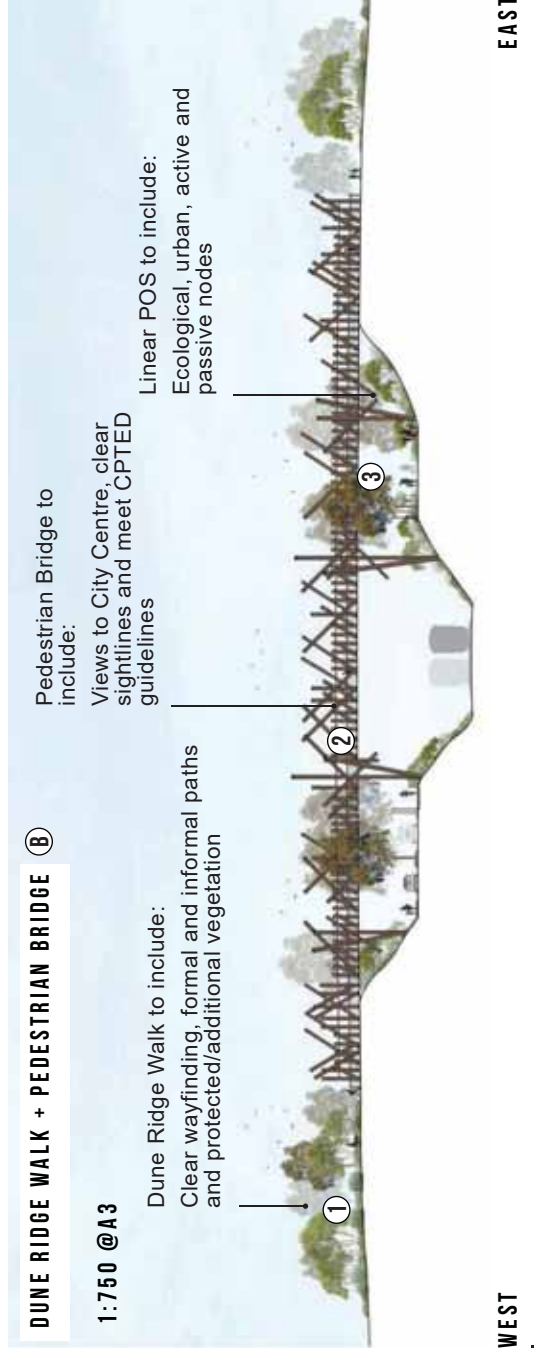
Dune Ridge Walk and Pedestrian Bridge - Indicative Section - UDLA
